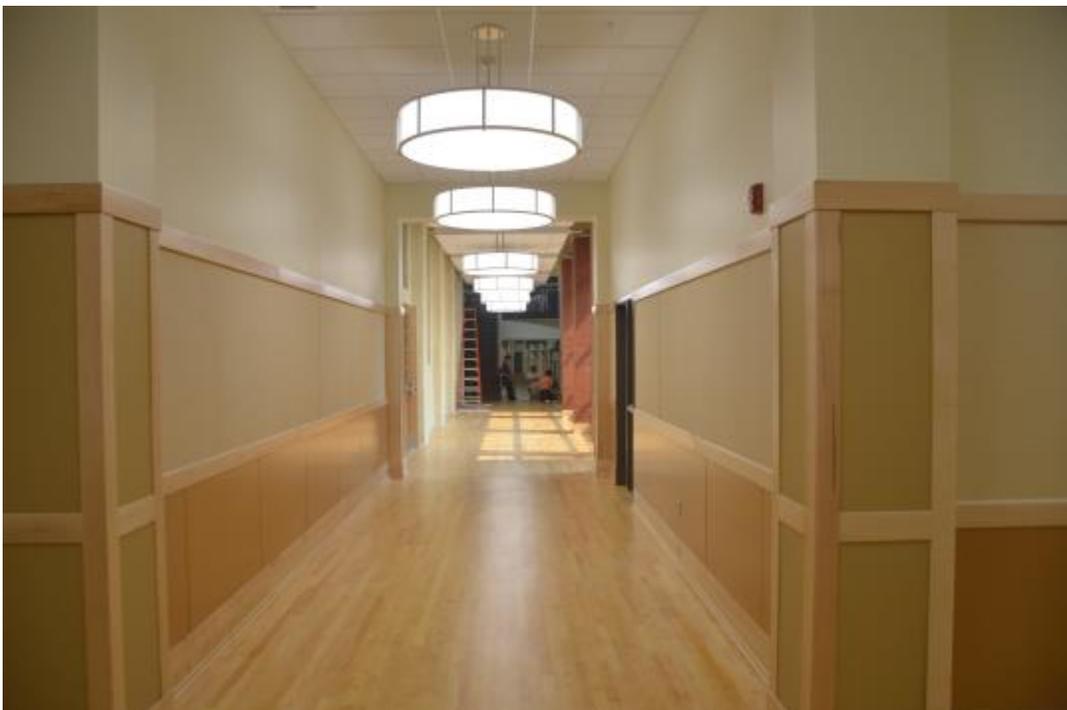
Looking East Along South Hall Toward 2015 Addition From 1921 Main Hall
